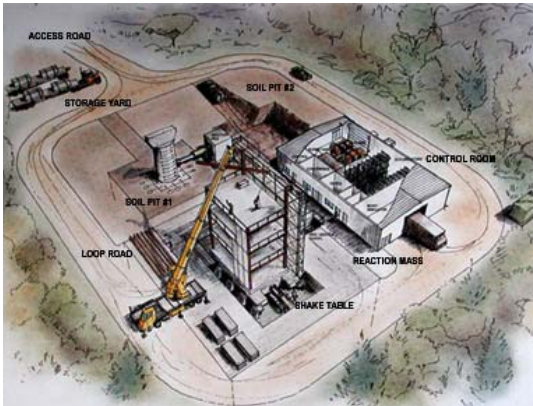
Outdoor shake table and soil-foundation structure interaction test facility with two soil pits at U.C. San Diego.
